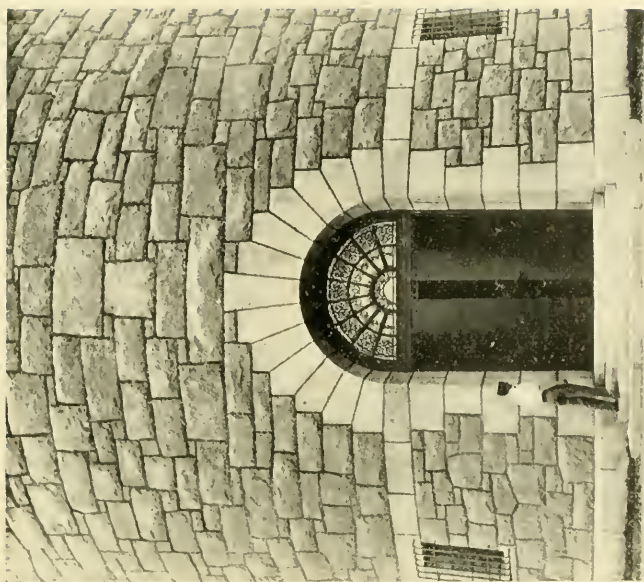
ENTRANCE TO MASONRY TOWER.
